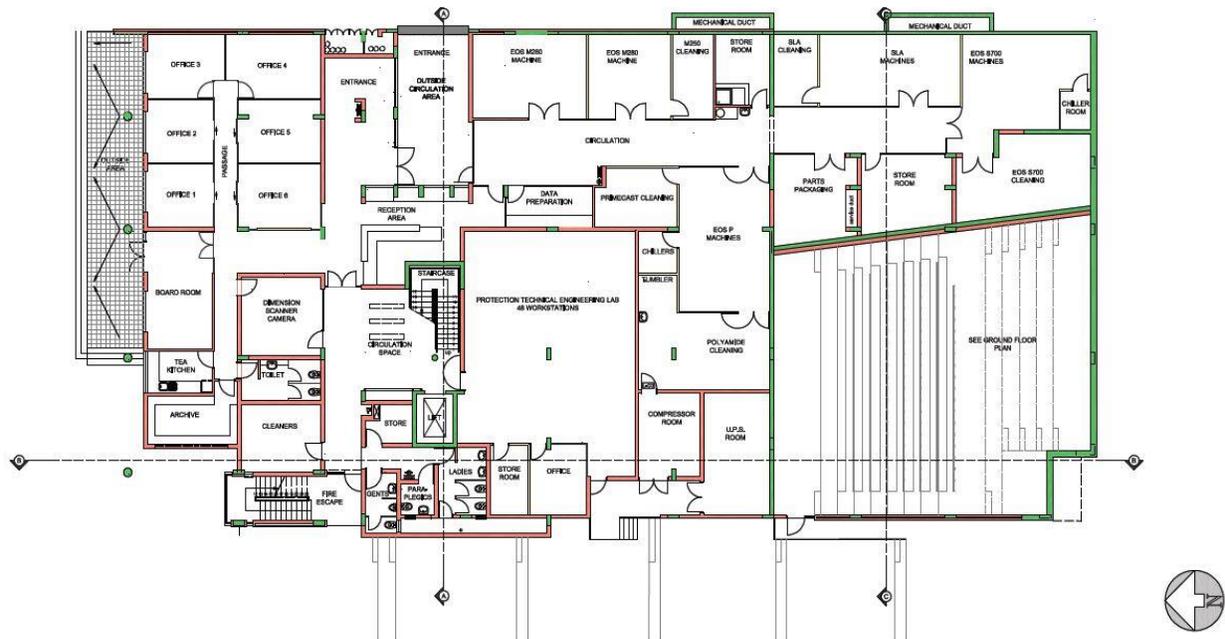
Lower Ground Floor Plan of the Engineering Technology Building (ETB) on the Central University of Technology (CUT) campus in Bloemfontein
